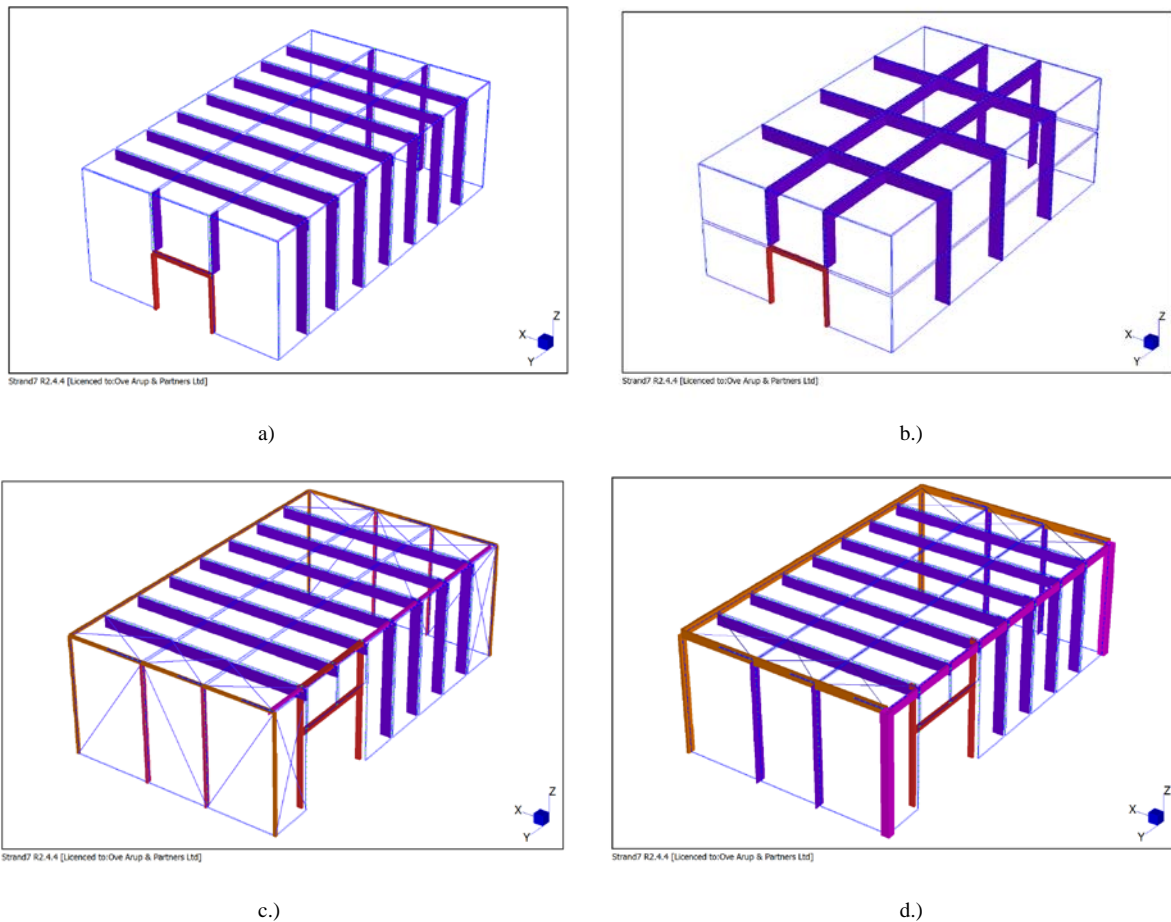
Glass box, design stages a.) Structural glass option 1, b.) Structural glass option 2, c.) Hybrid glass steel braced frame d.) Hybrid glass steel portal frame
